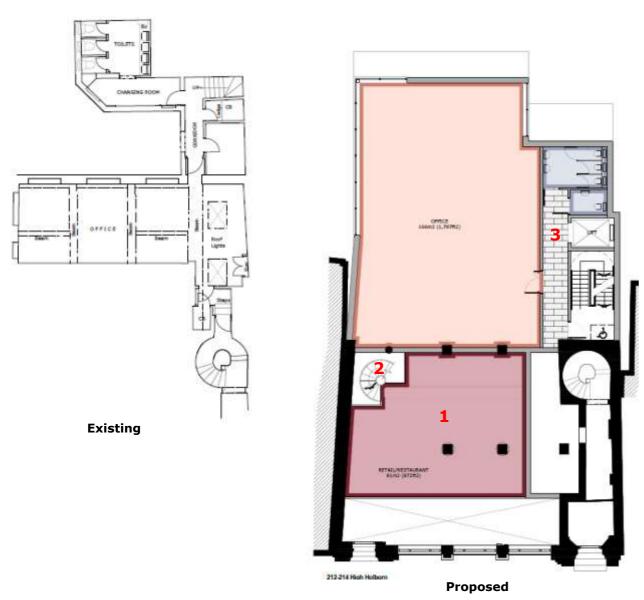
Existing mezzanine (left) and proposed mezzanine (right).
